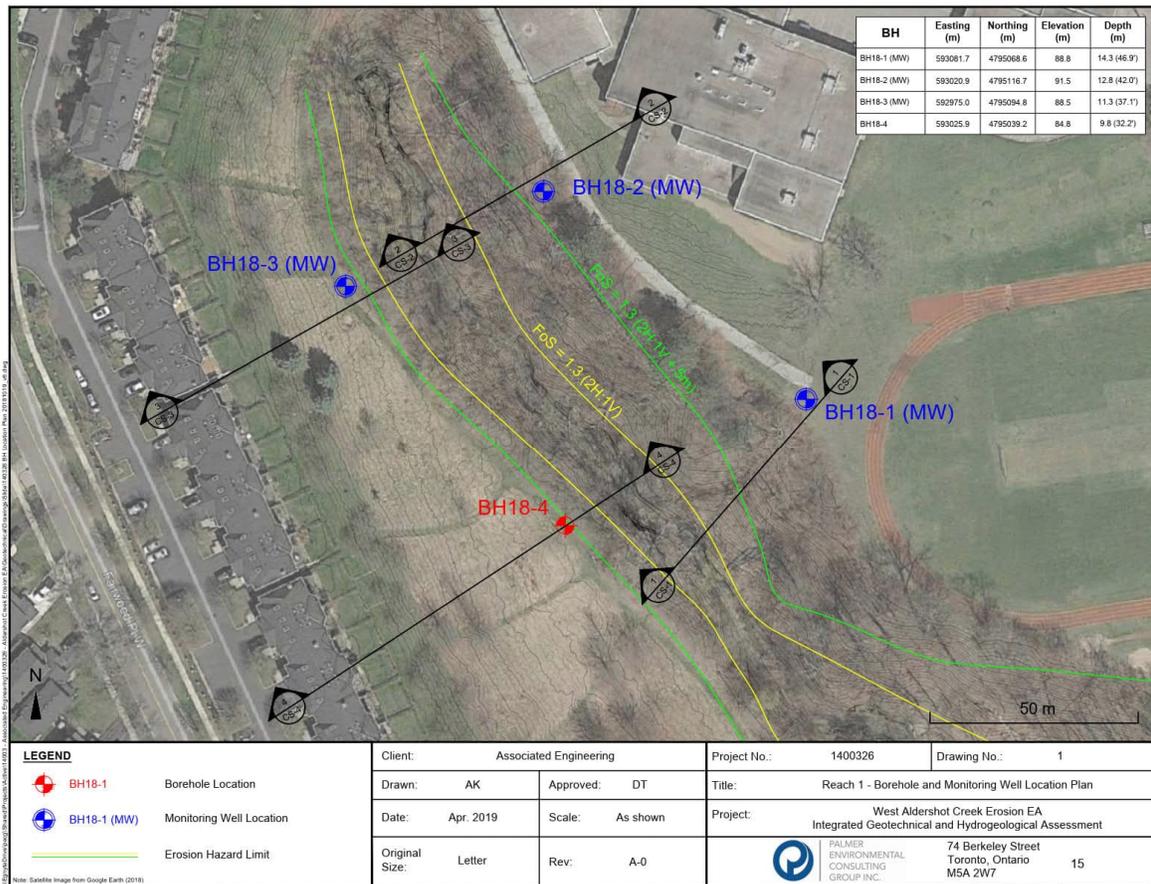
Borehole and Monitoring Well Location Plan (Part 1)
